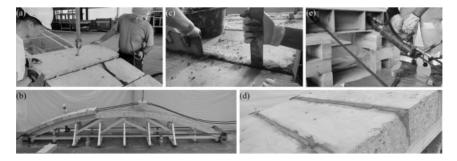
Assembly stages: (a) and (b) concrete blocks placement, (c) and (d) grouting joints with mortar, (e) post-tensioning with hydraulic jacks.
